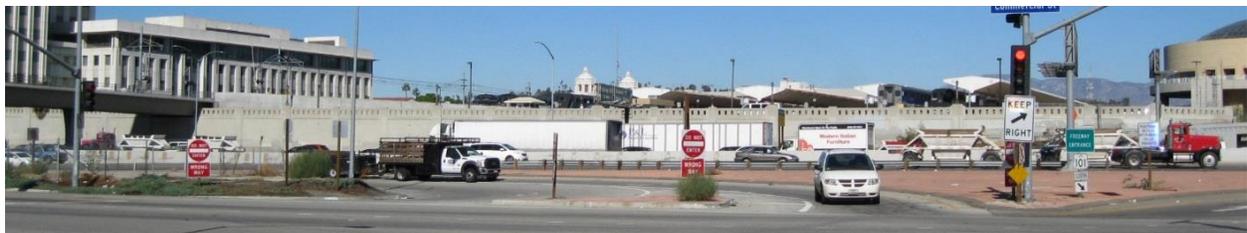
Cesar Chavez Avenue Undercrossing (View East)
